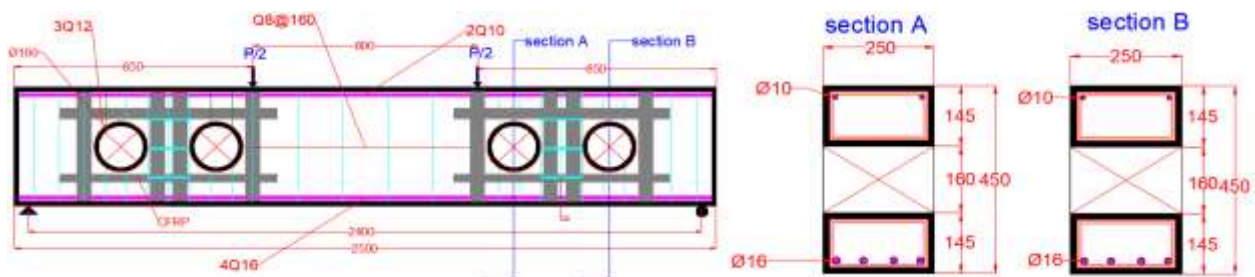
Detailing of beam with four circular opening strengthened with CFRP.
